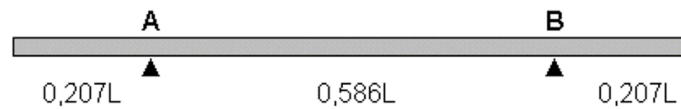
Scheme for lifting prefabricated piles on two hoists
